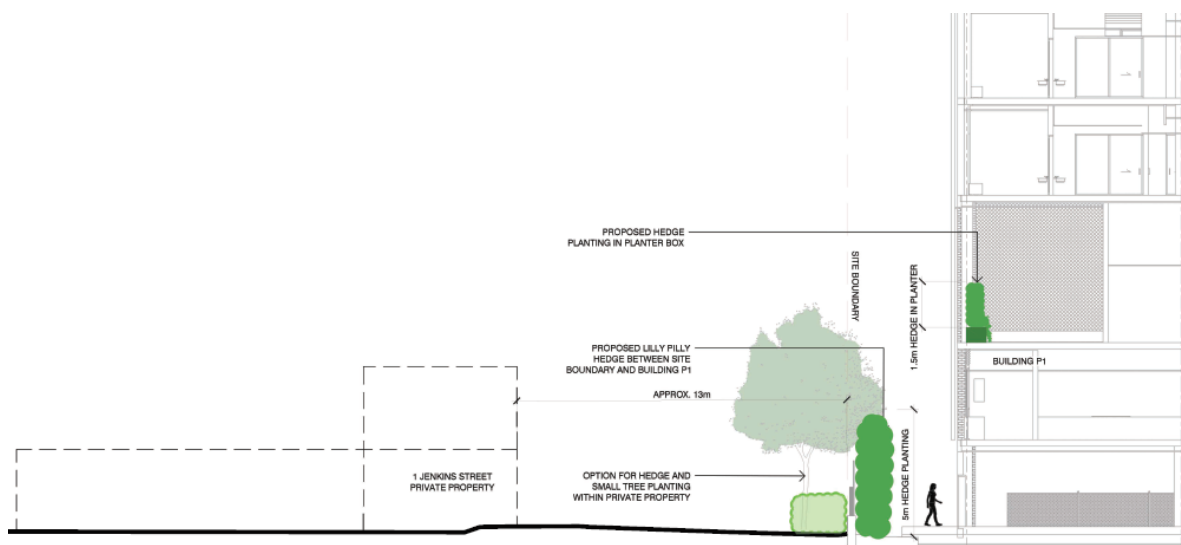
Interface section of Building P1 and neighbouring property at 1 Jenkins Street
